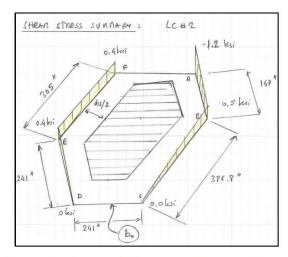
Shear Stresses at Critical Foundation Cap Sections Around the Tower Leg Perimeter under Maximum Loading – Side A-F Represents the Edge of the Cap
